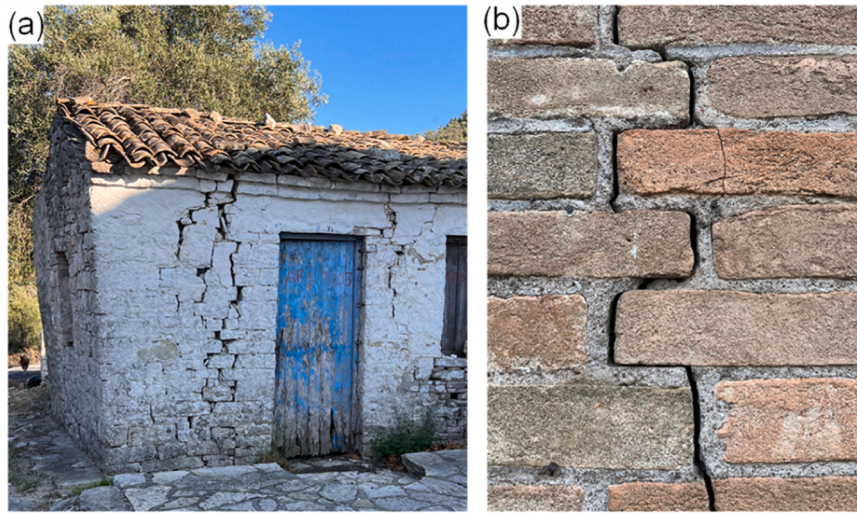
(a) Damage on a dry-joints stone masonry house in Paxos island (Greece), (b) tensile failure on head joints in a brick masonry wall in Rome (Italy).
